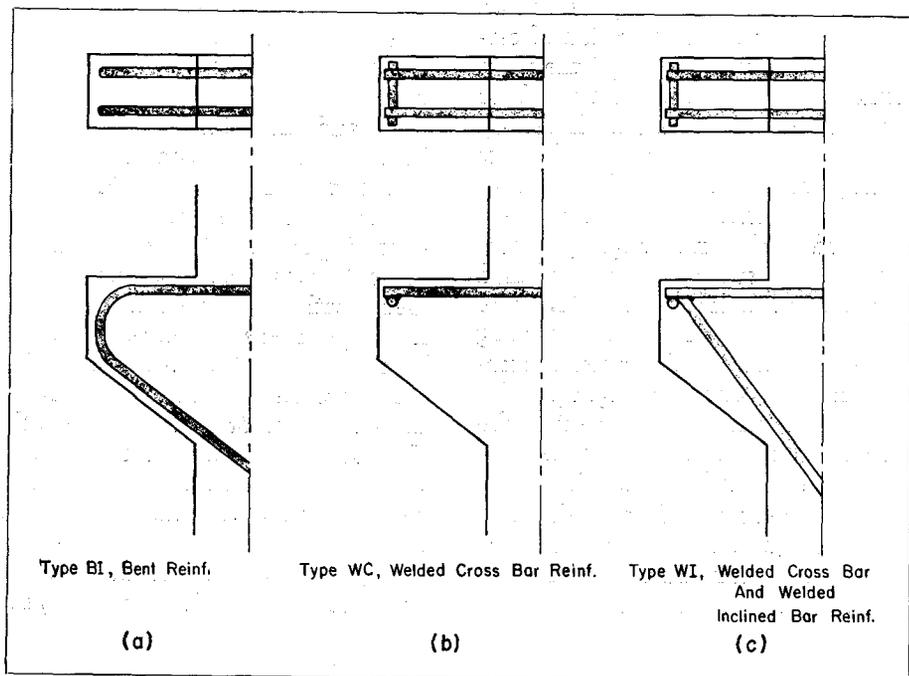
Detailing of Corbel Reinforcement in Auxiliary Test Series
